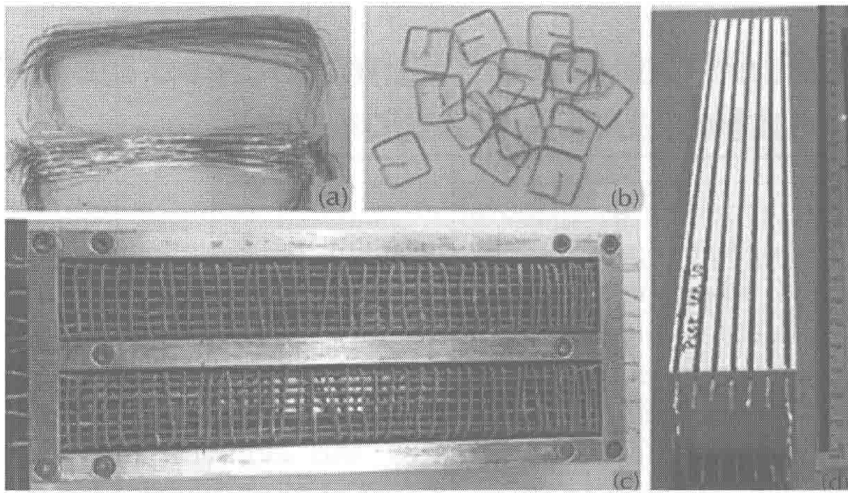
Construction of reinforced concrete model columns: (a) longitudinal steel with (upper) and without (lower) sand coating; (b) shear links; (c) steel within formwork; and (d) column model.
